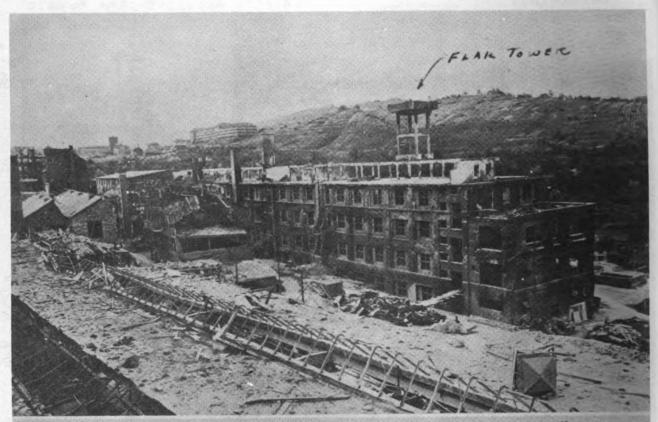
View showing overall damage to plant, looking southeast. Note blast and fragmentation damage to reinforced concrete frame structure. Note reconstructed brick wall, left center, and concrete flak tower on top of exposed concrete frame. Reproduction of captured photo.
